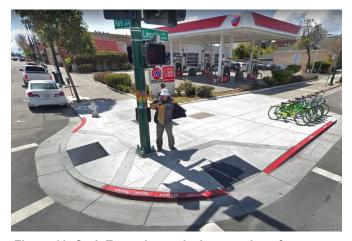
Curb Extension at the Intersection of Lincoln Avenue and Park Street
